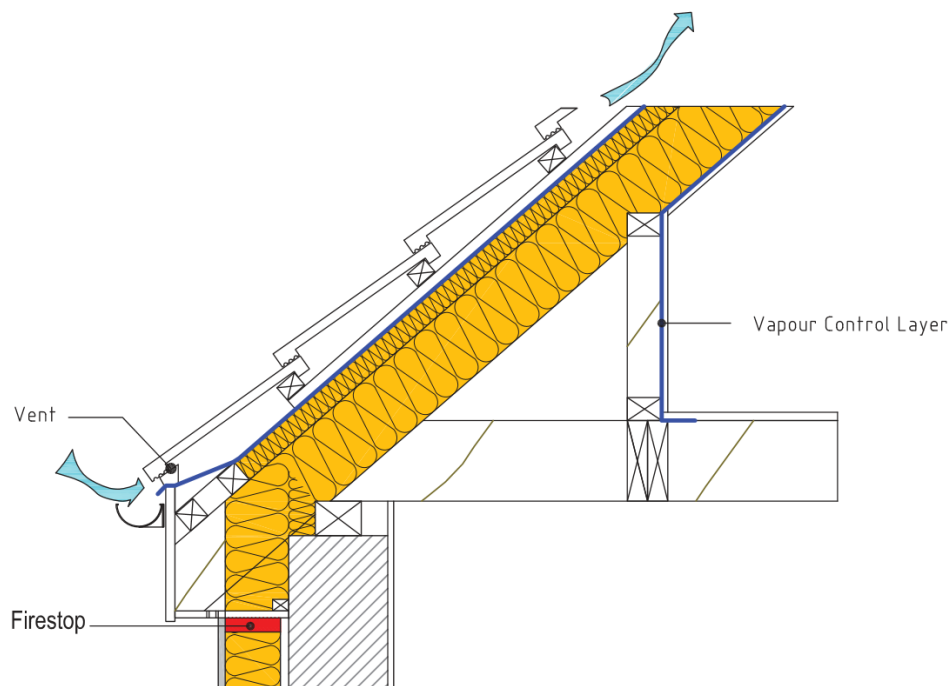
Roof and external wall insulation junction (Reproduced from S.R. 54:2014 with the permission of NSAI)
